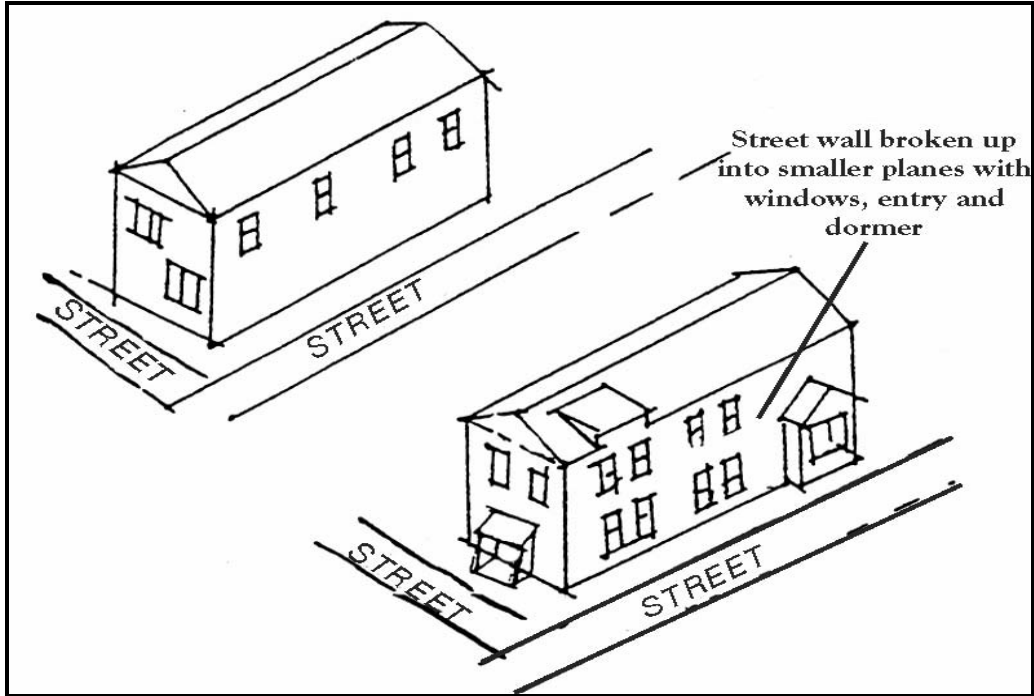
Create visual interest along the street. Incorporate porches, dormers, and bays to reduce scale of buildings and so as to relate better to existing structures.
